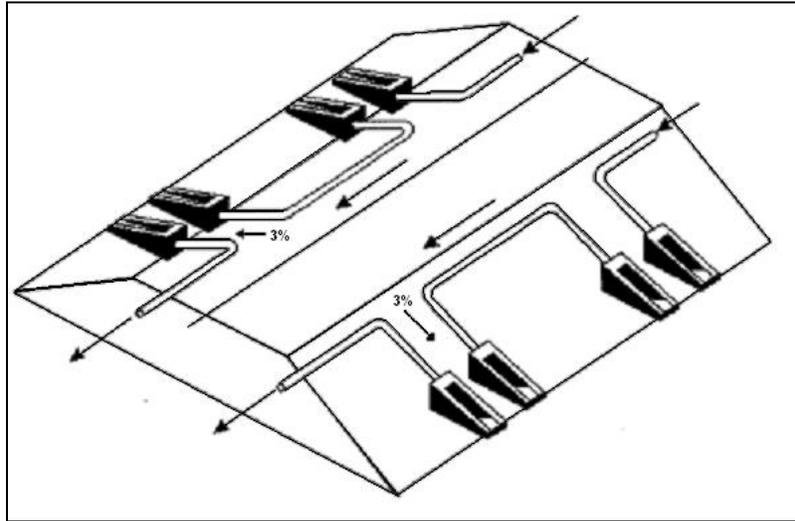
Illustration of Large-Radius Bends Recommended for Drainage Outlet
